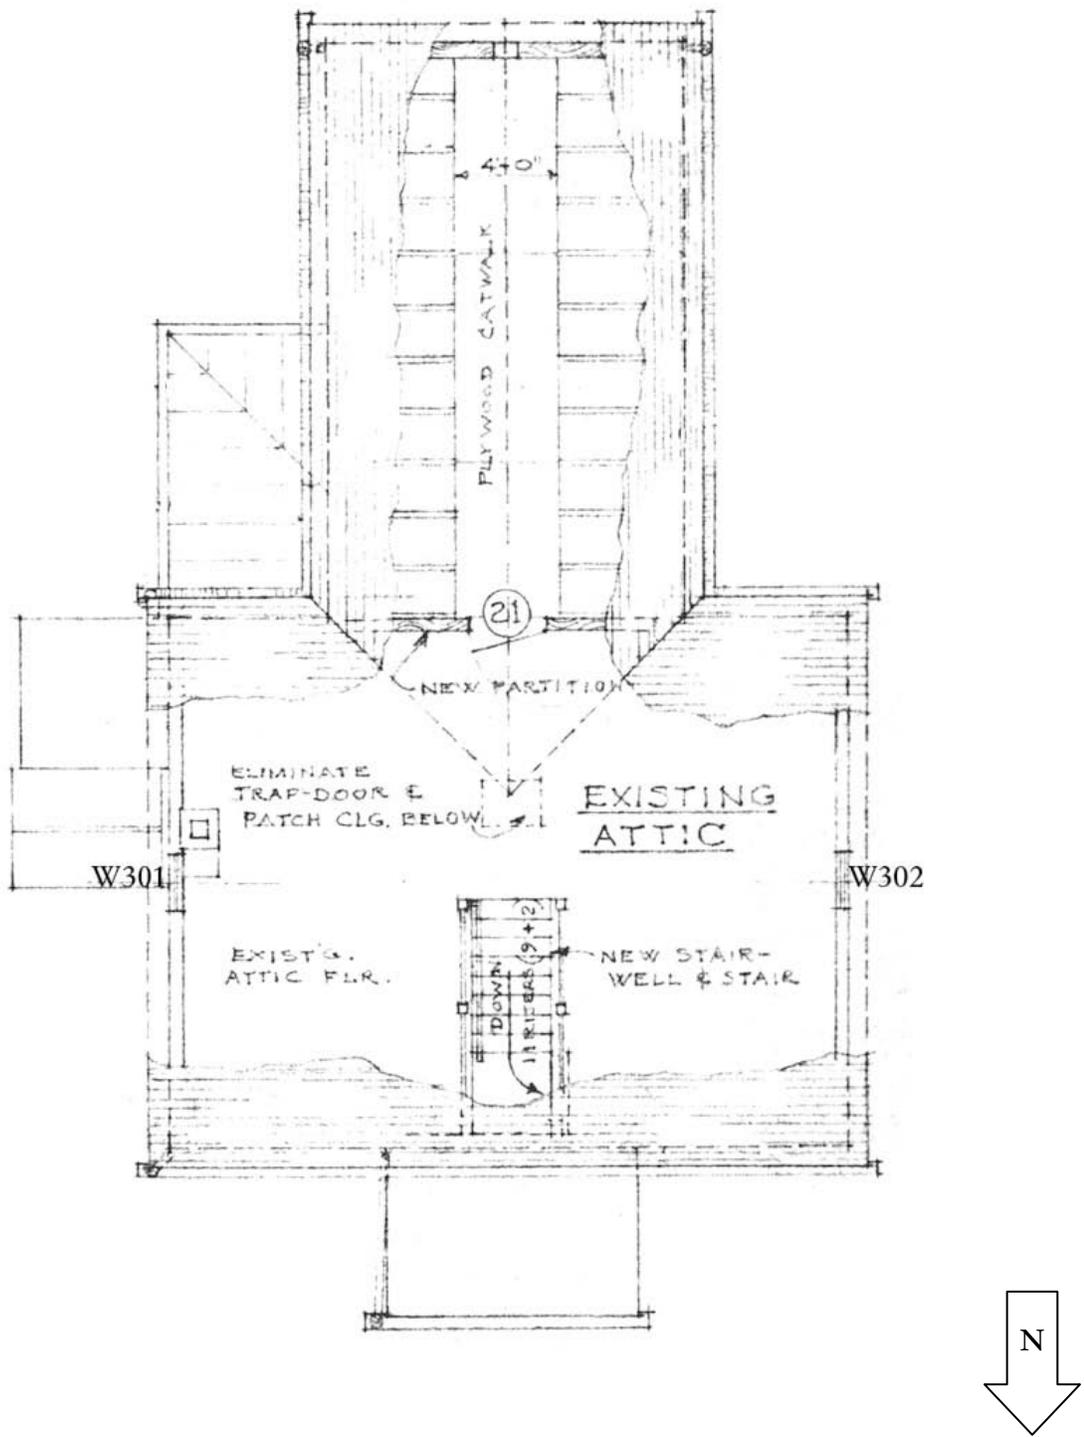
Gray Cottage, attic floor plan with window-opening numbers assigned for the current project.
